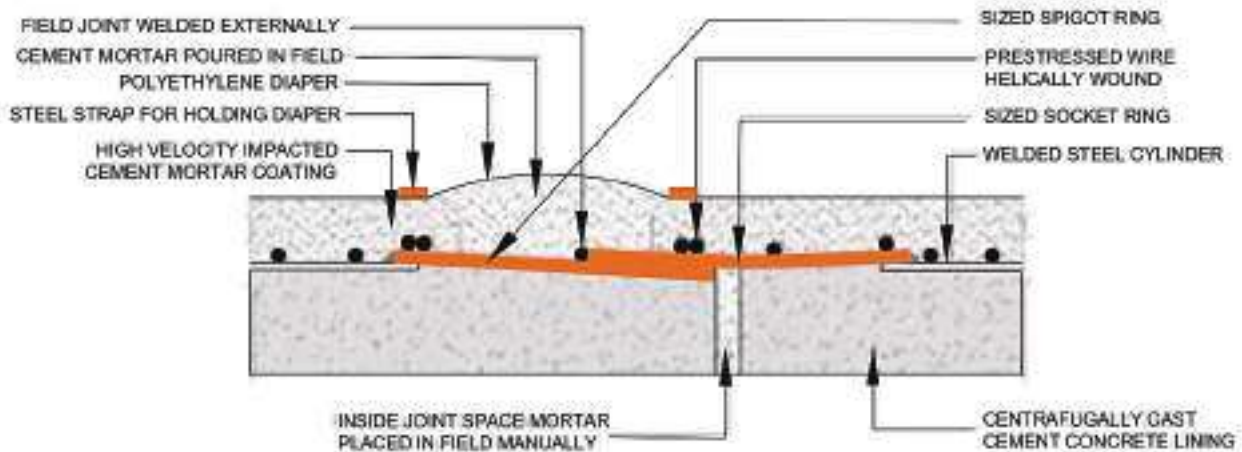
PCCP Pipe Sliding Overlap Welded Joint
